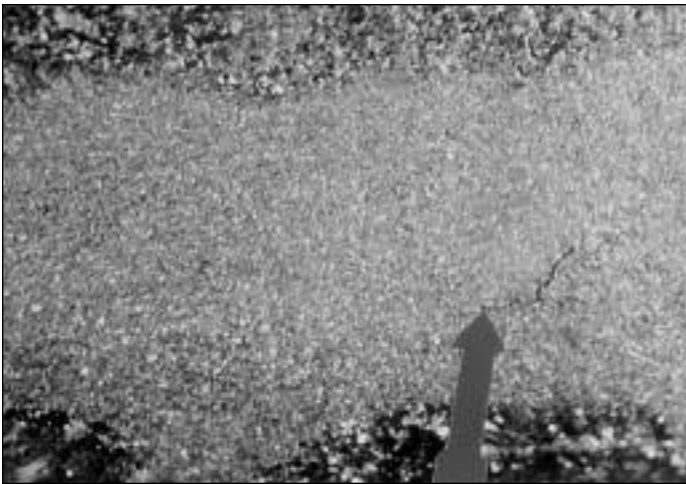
Close-up on bottom side of D-10 at location depicted in Photo D5. Note fracture.
